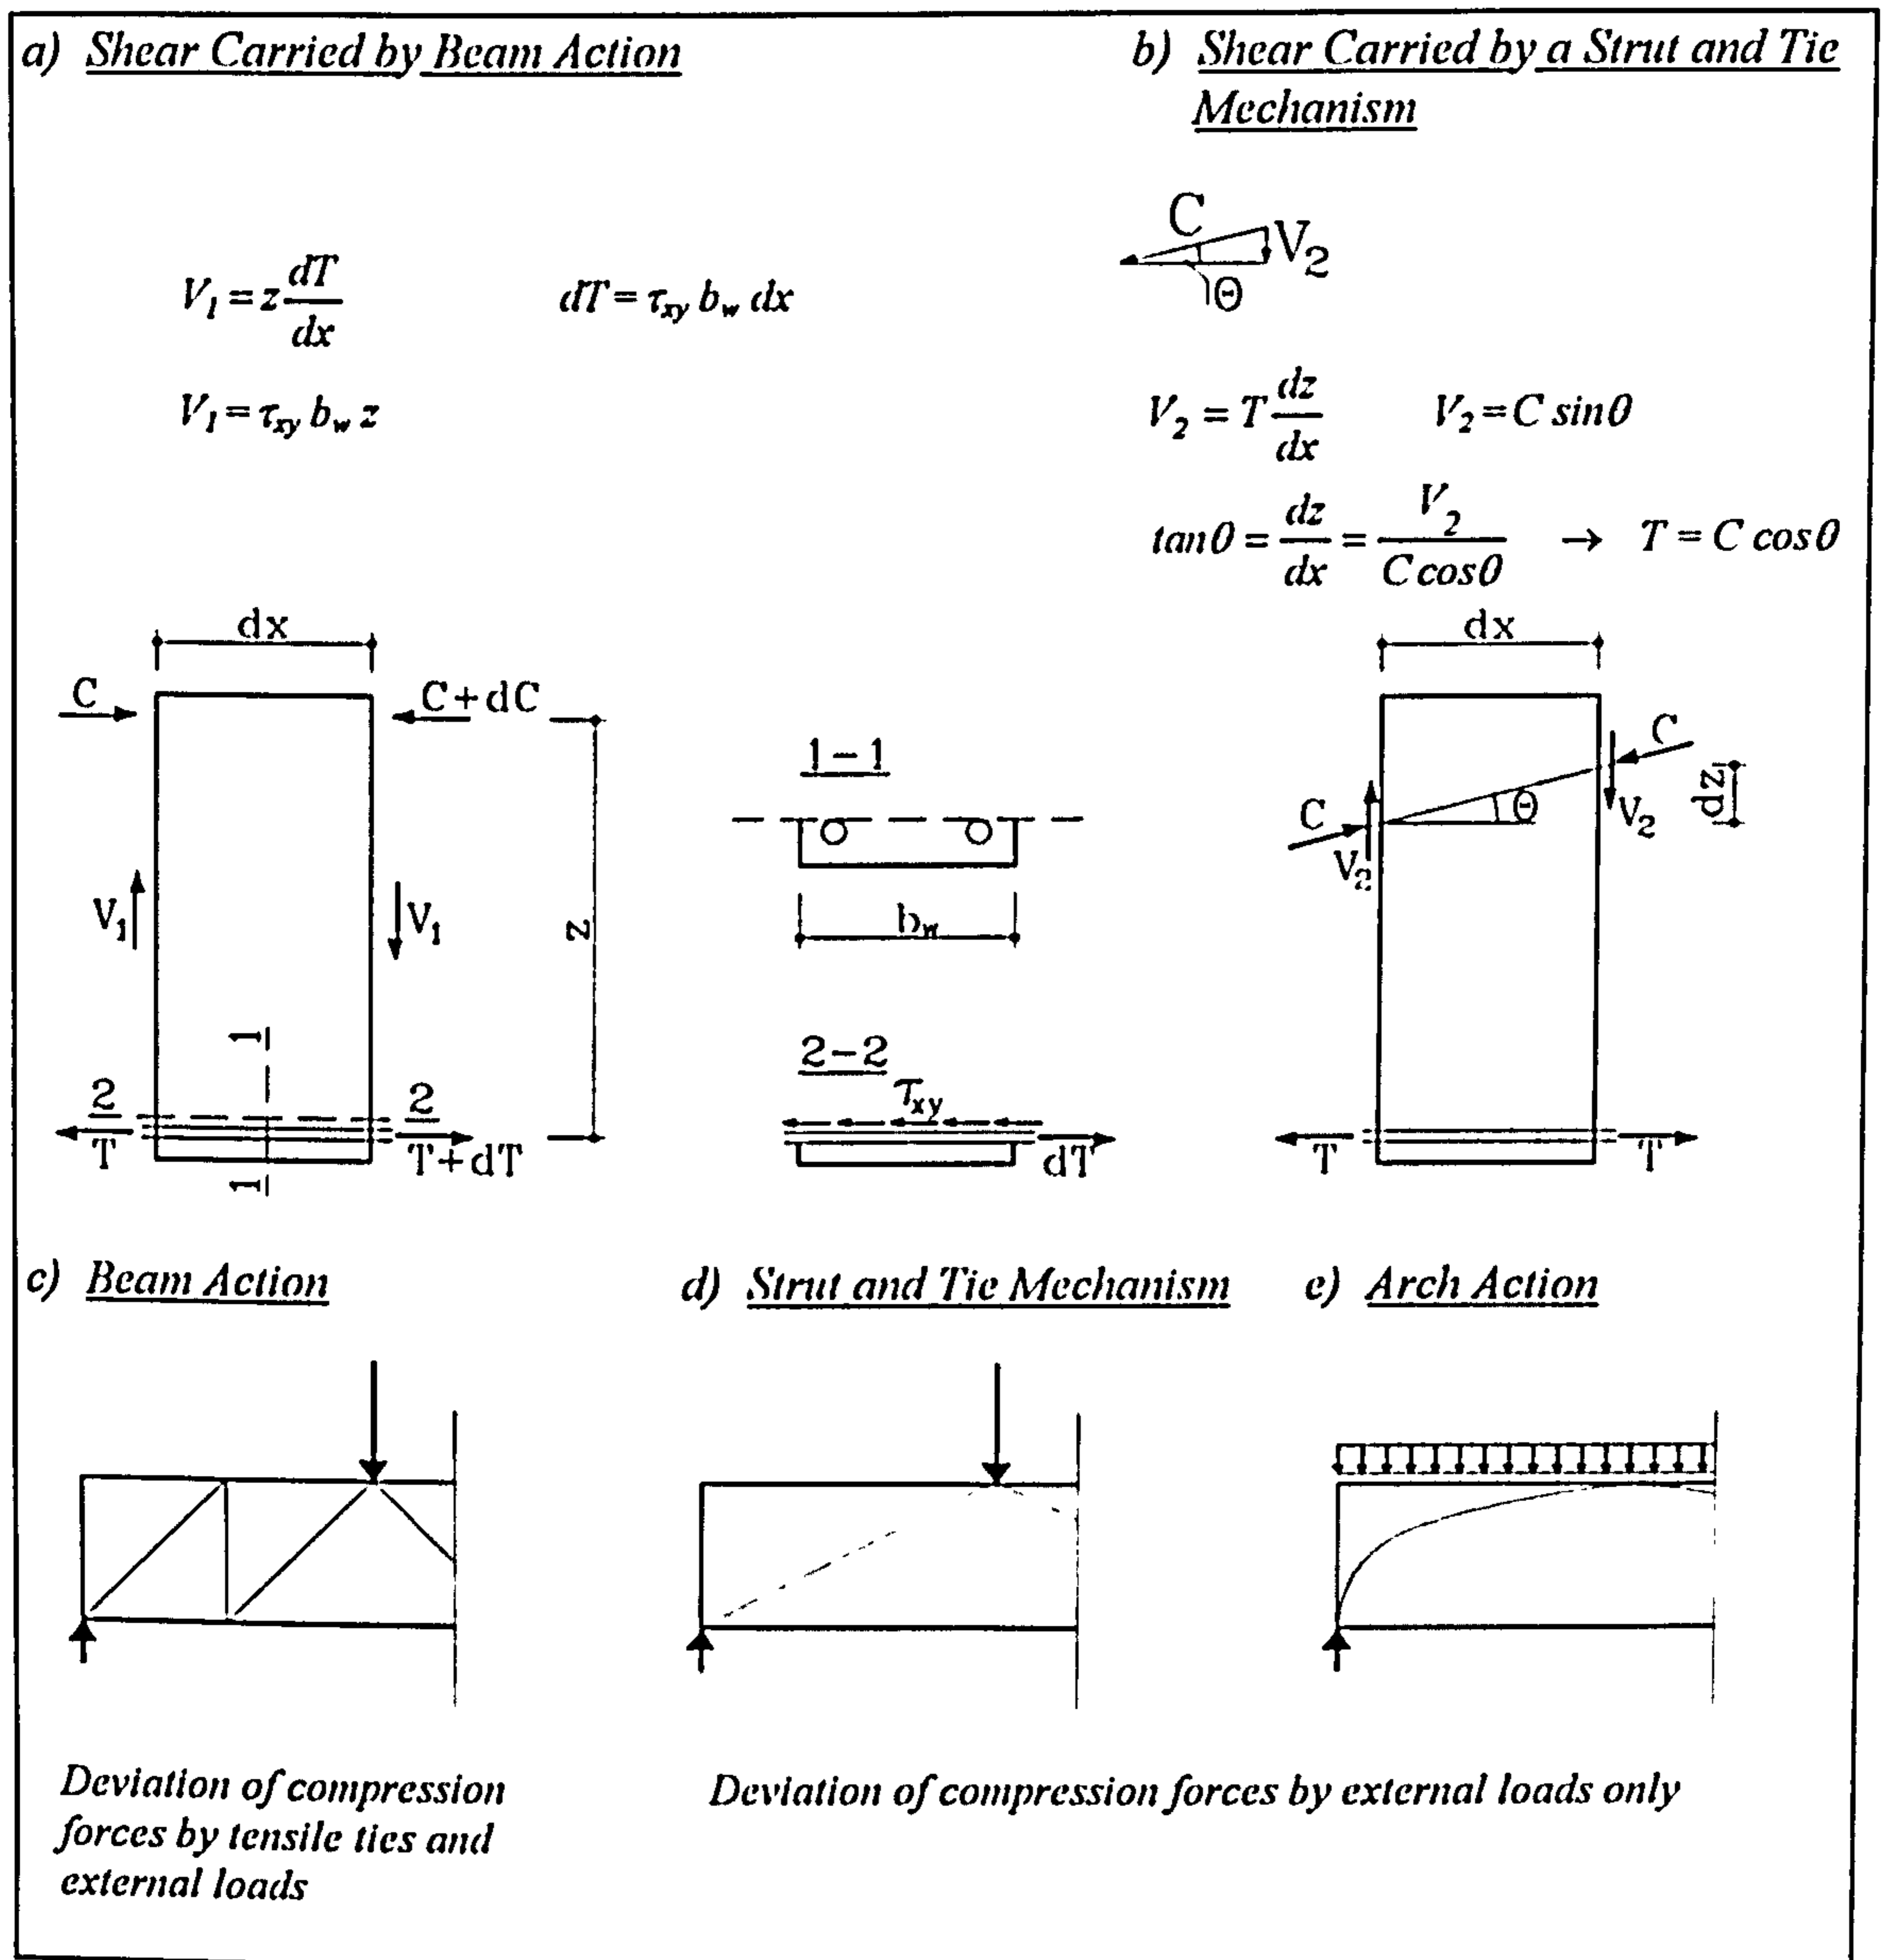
Beam Action and Strut and Tie Mechanism in an RC Beam
